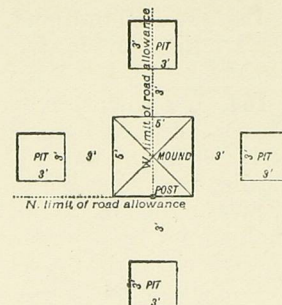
Post, mound and pits for section and quarter section corners on correction line, north limit of road allowance—Plan.
